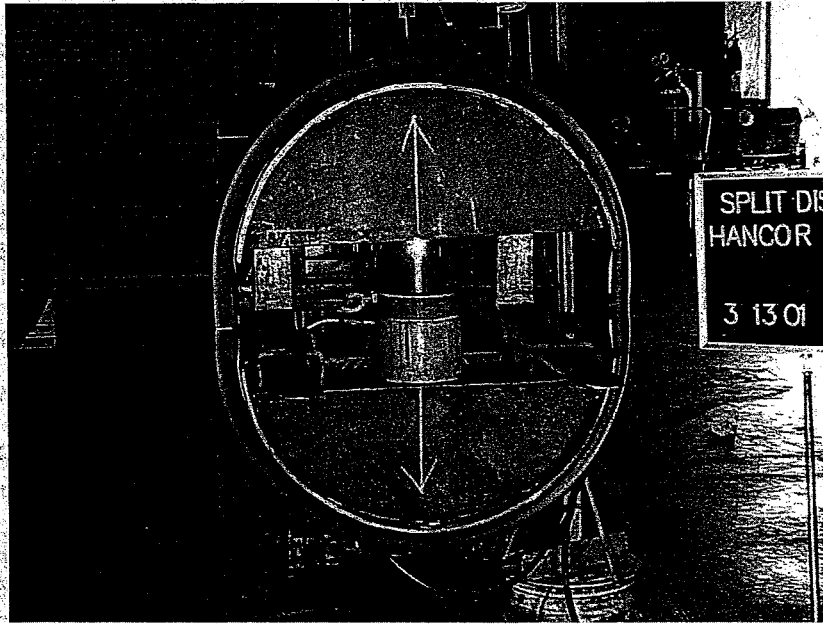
Deformation of HANCOR 36 specimen under tensile load
